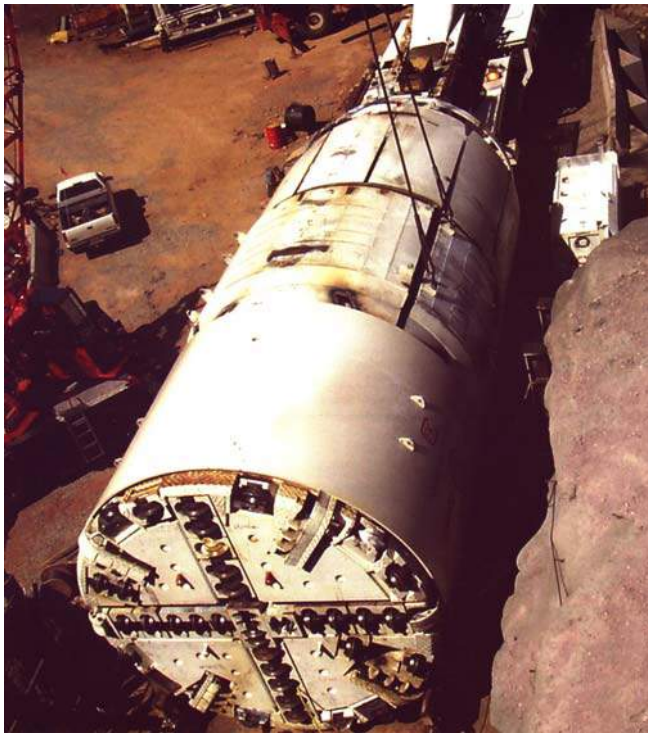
Rock tunnel TBM (2 m diameter) (Laboratory TBM at Excavation Engineering and Earth Mechanics Institute, EMI, Colorado School of Mines; photo International Mining & Minerals, UK, Oct. 2001)
